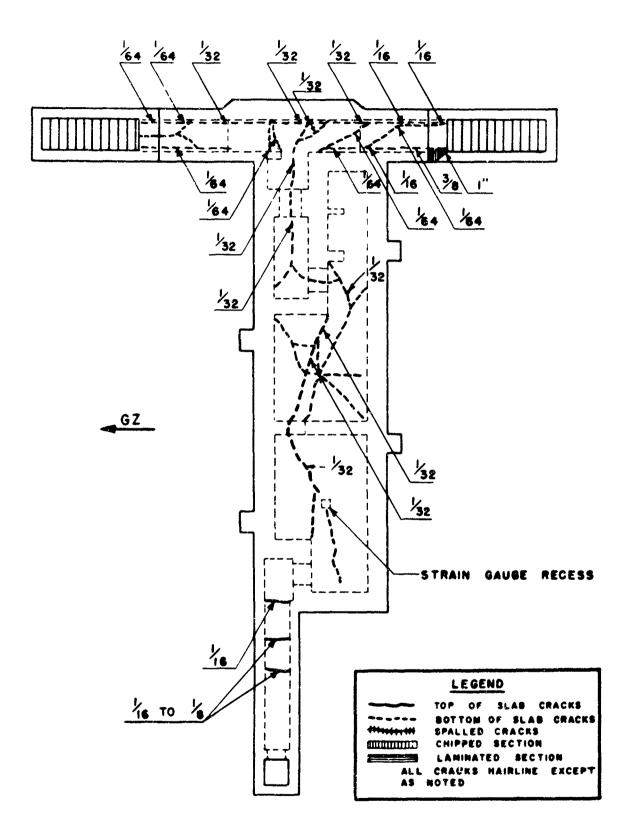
Roof-slab crack pattern, structure II-1.
